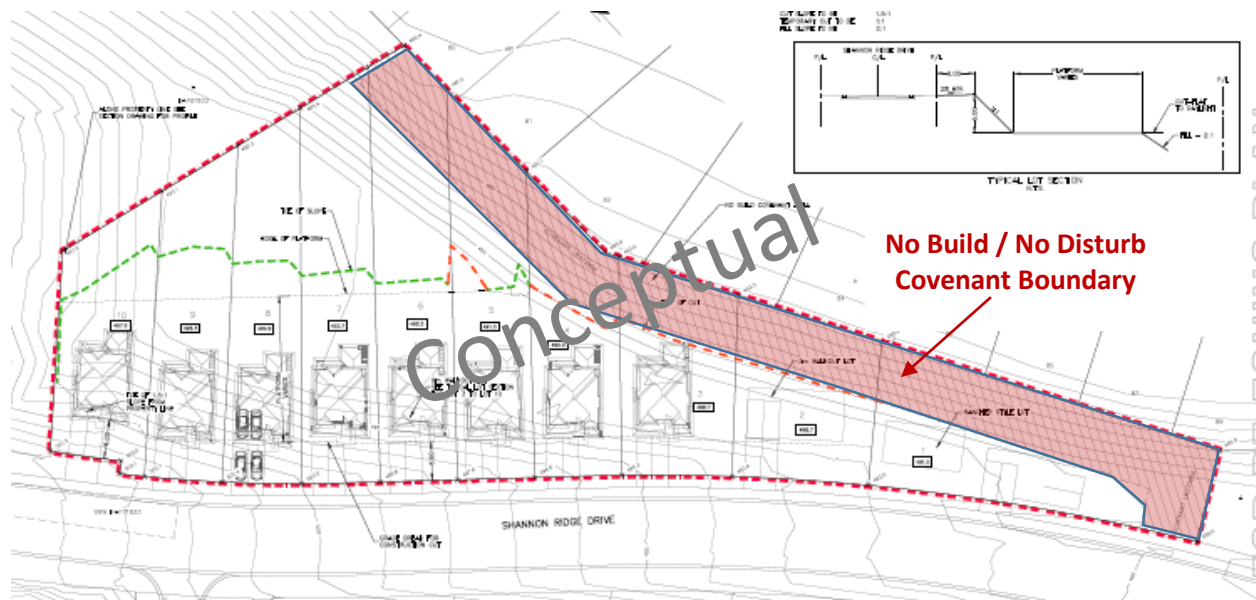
preliminary grading and subdivision plan with covenant boundary.
